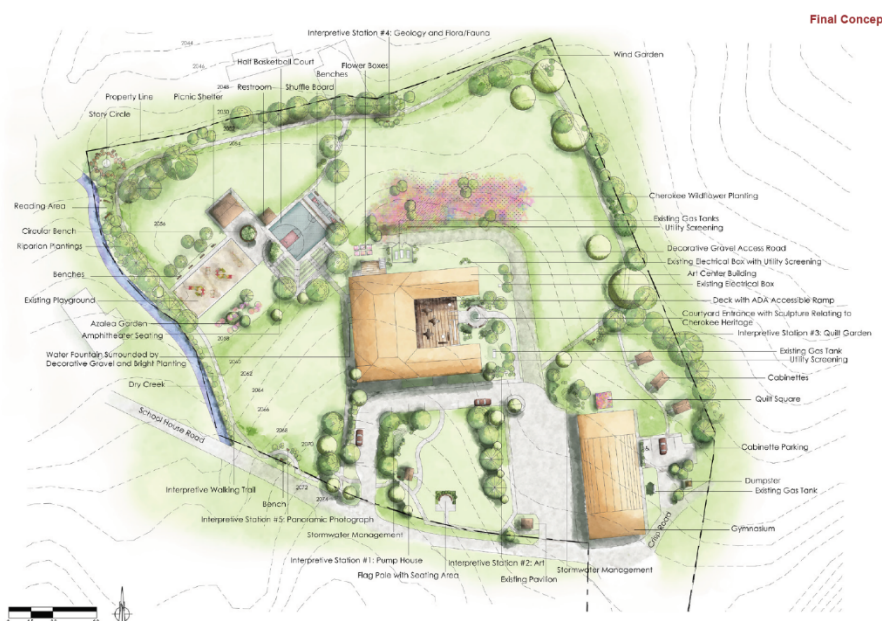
site plan. Source: <https://vtechworks.lib.vt.edu/bitstream/handle/>
